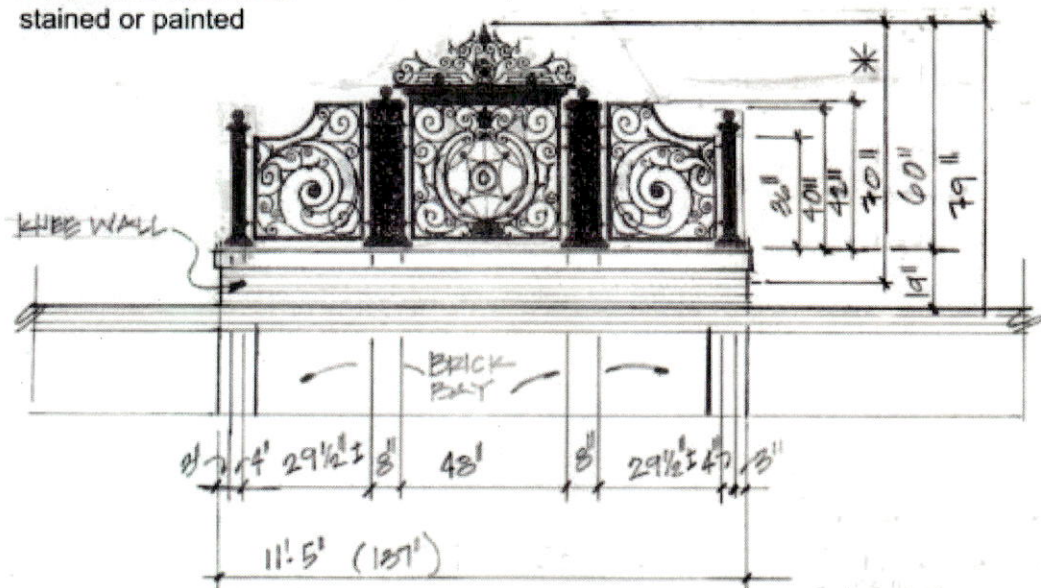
Decorative metalwork on top of knee wall above projecting bay
